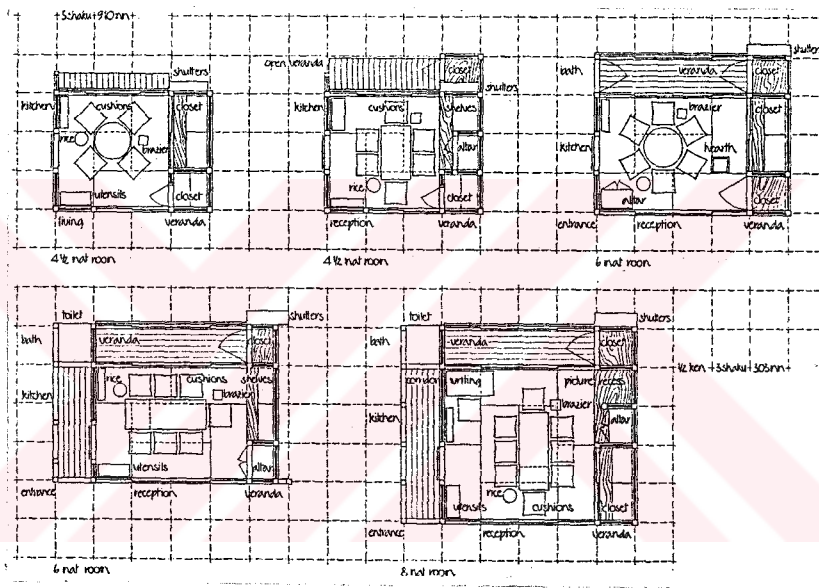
Typical examples of floor plans of dining room (Engel, 1964; 242)
